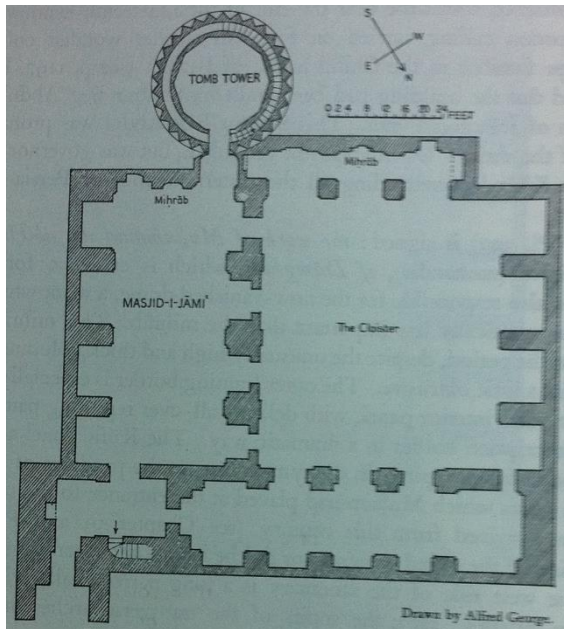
Bistam Complex ground floor plan (Pope, 1969)
